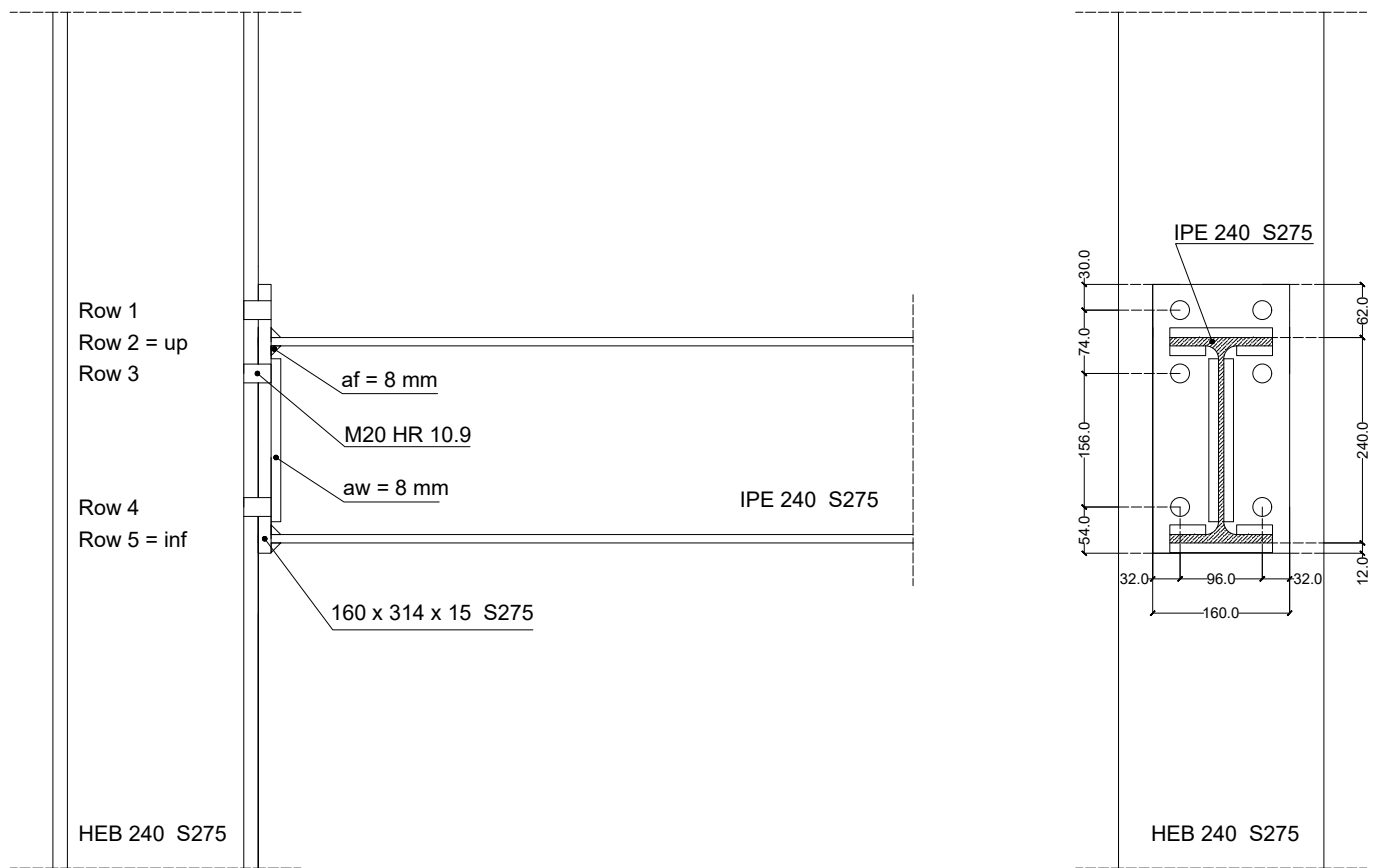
Coimbra - Extended end-plate joint configuration - Technical drawing
